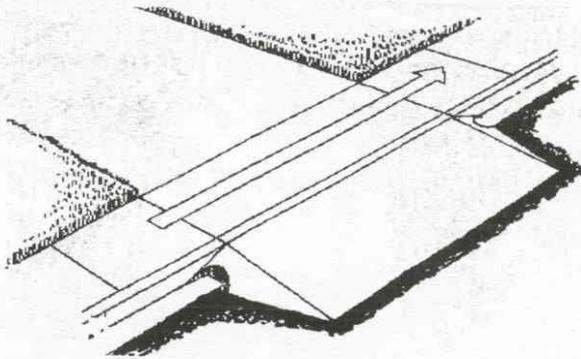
SATISFACTORY DESIGN: Built-up driveway crossings promote pedestrian access on narrow sidewalks by extending the ramp into the roadway and allowing the sidewalk to remain level. This ramp works better on roadways with on-street parking and in areas with no snow.
